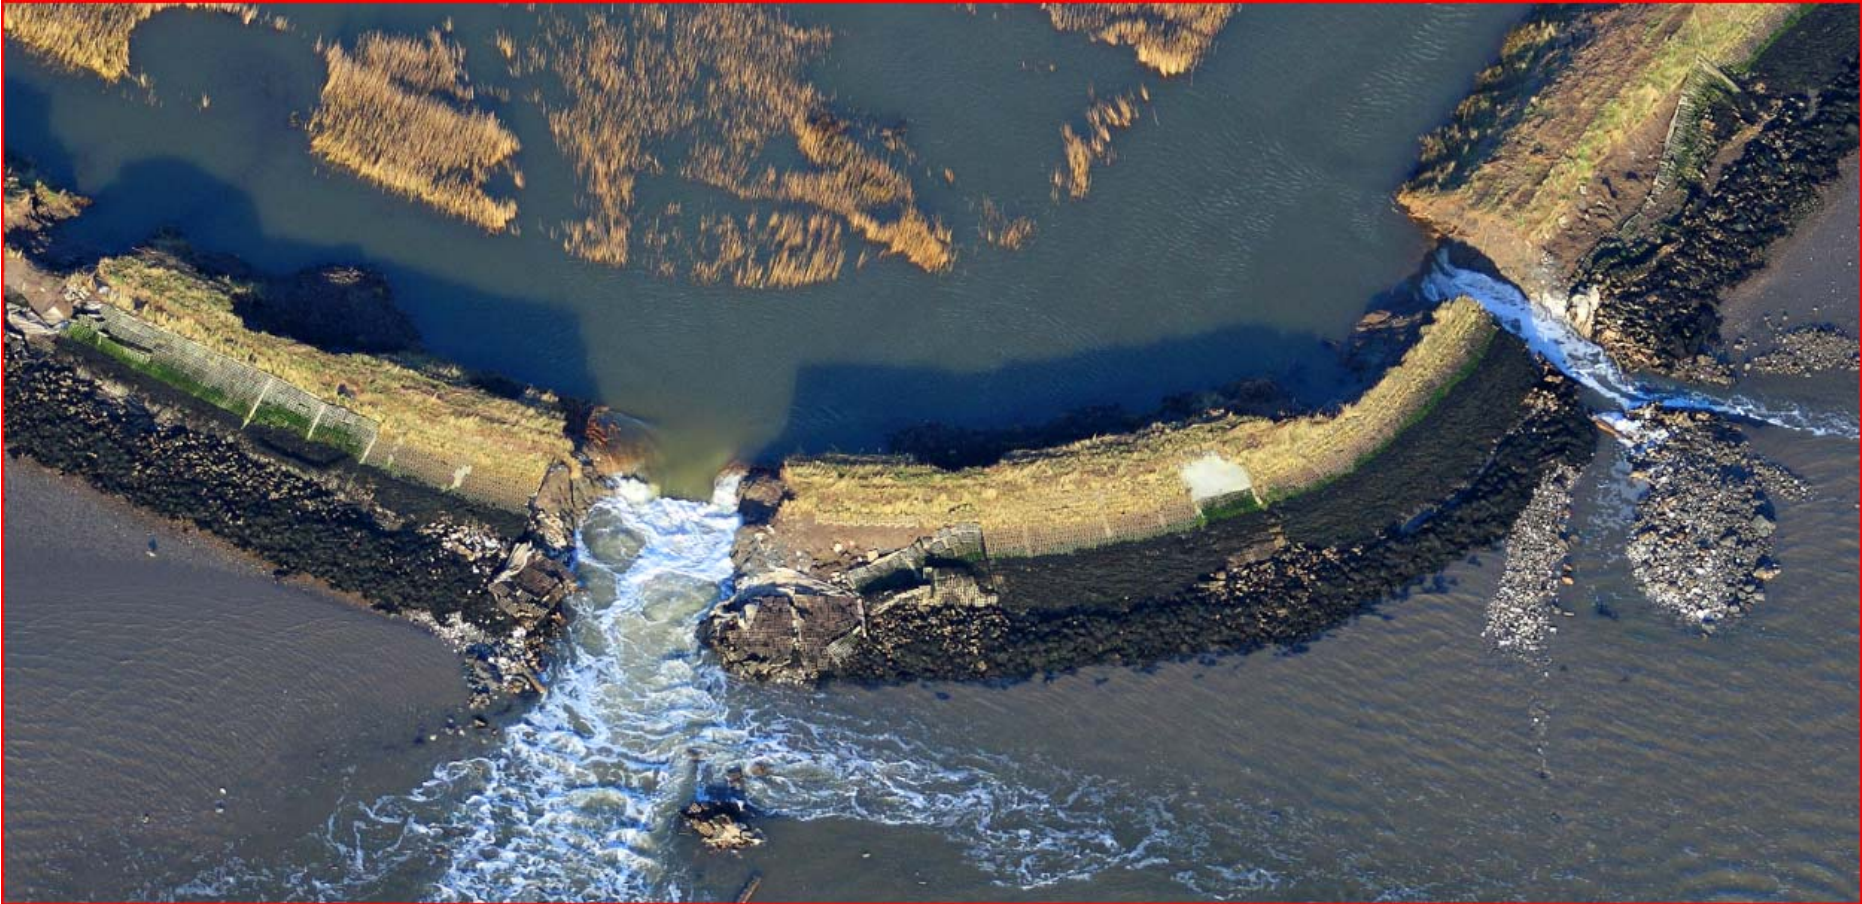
Extent of land flooded following embankment breach, Burnham Deepdale, Norfolk – North Sea Tidal Surge – Dec 2013
